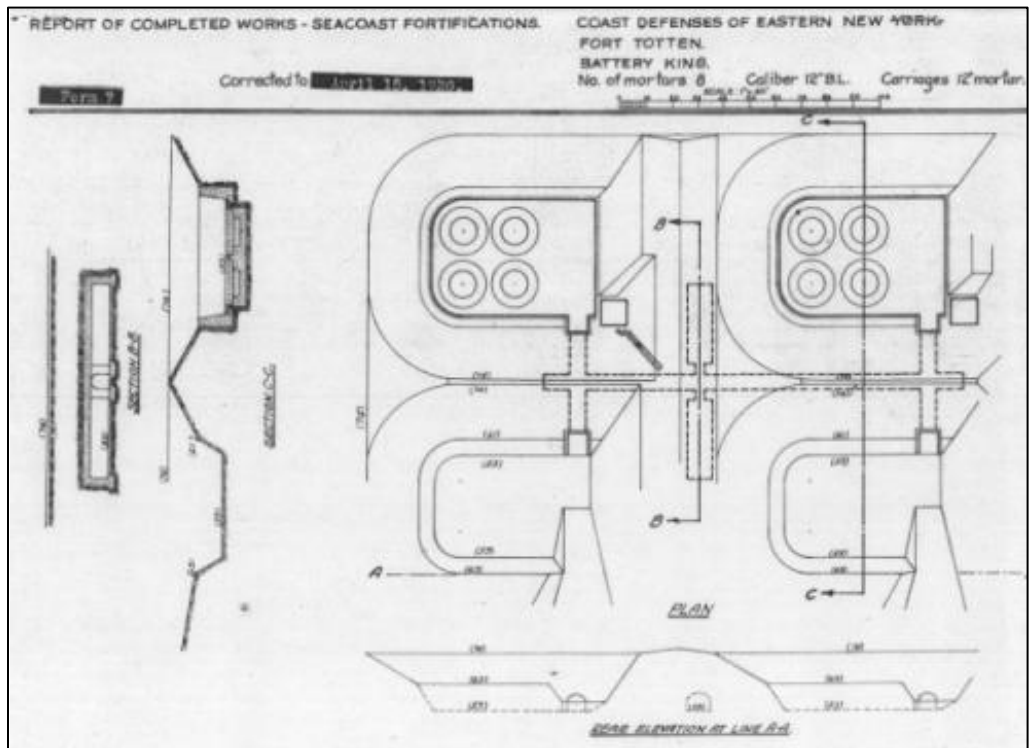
Plan and Sections of Battery King, upgraded 1896-1899 (NARA, 1920, Report of Completed Works)
